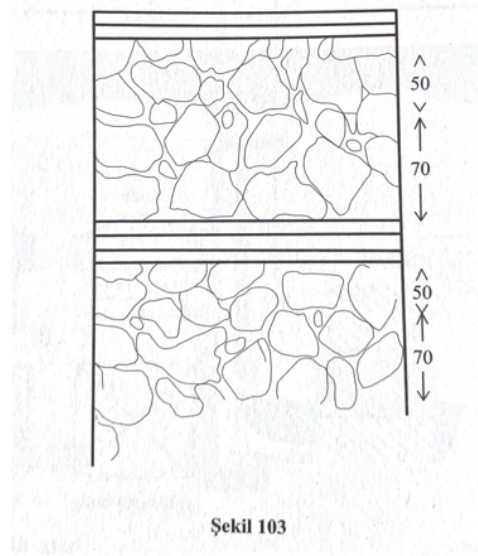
Masonry Wall Construction from “*Kargir İnşaat ve Eşkali*” (Ali Talat, 2022)
